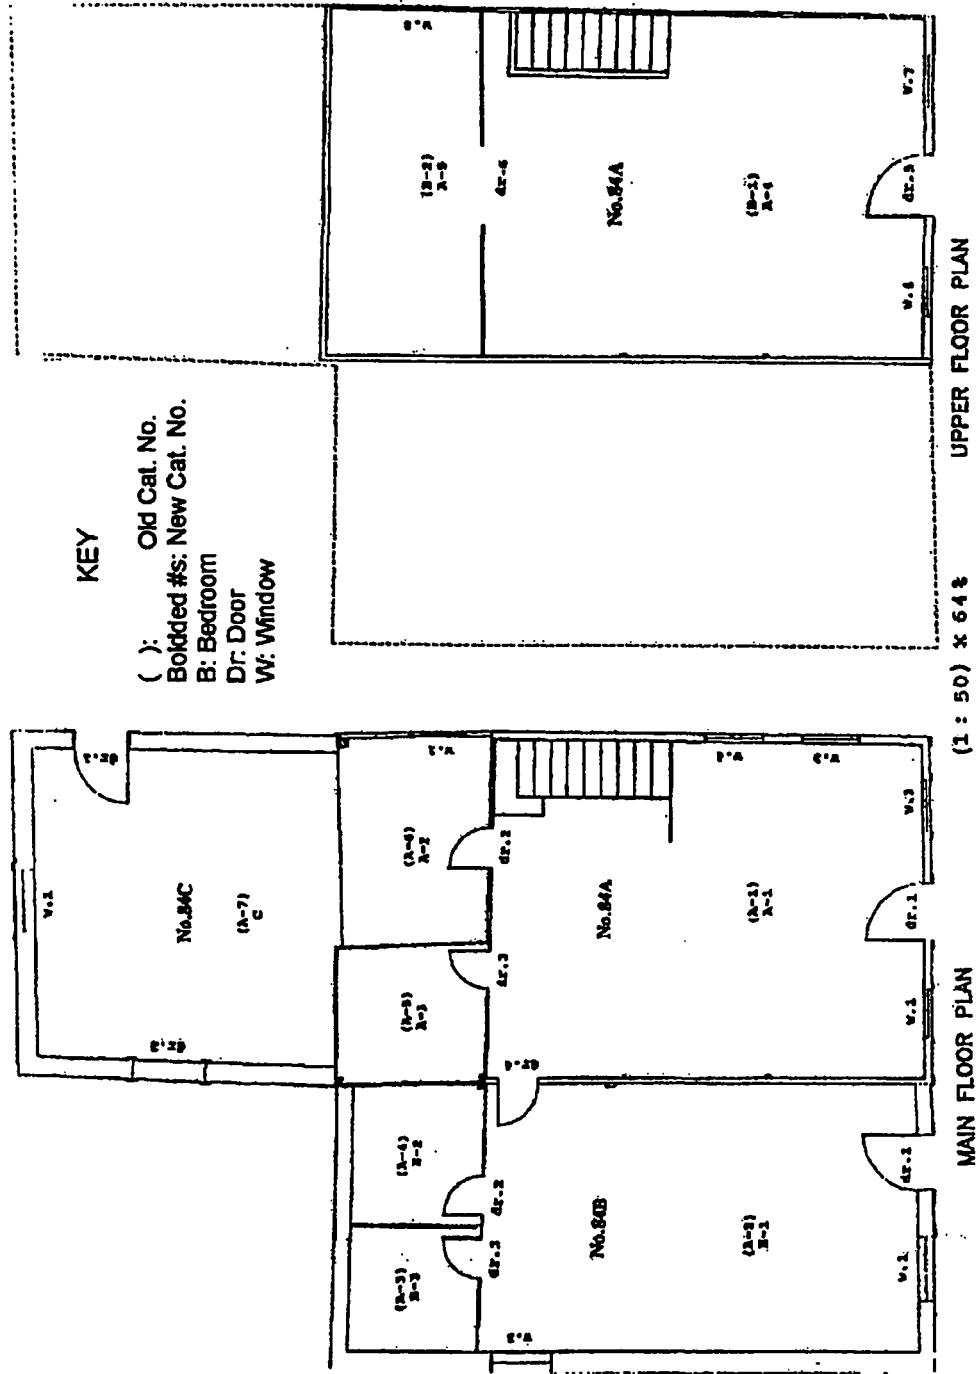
The Chih Kung Tang House (84): (Left) main floor plan, (Right) upper floor plan. (Drawn by Richard Caywood.)
